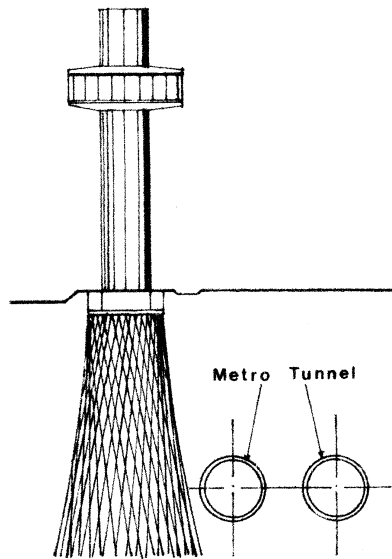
Panorama Tower, Tokyo, Arrangement of RRP type minipiles (Lizzi, 1982)
